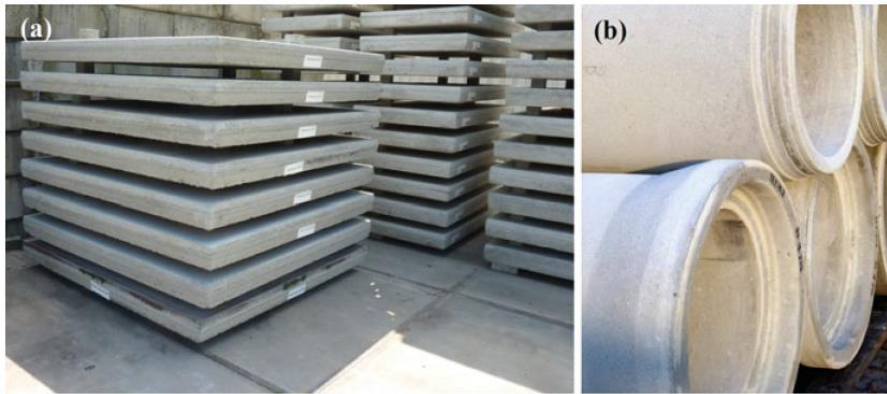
Storage of concrete products made with ASCEM® cement (Provis & Van Deventer, 2014, p. 326).
